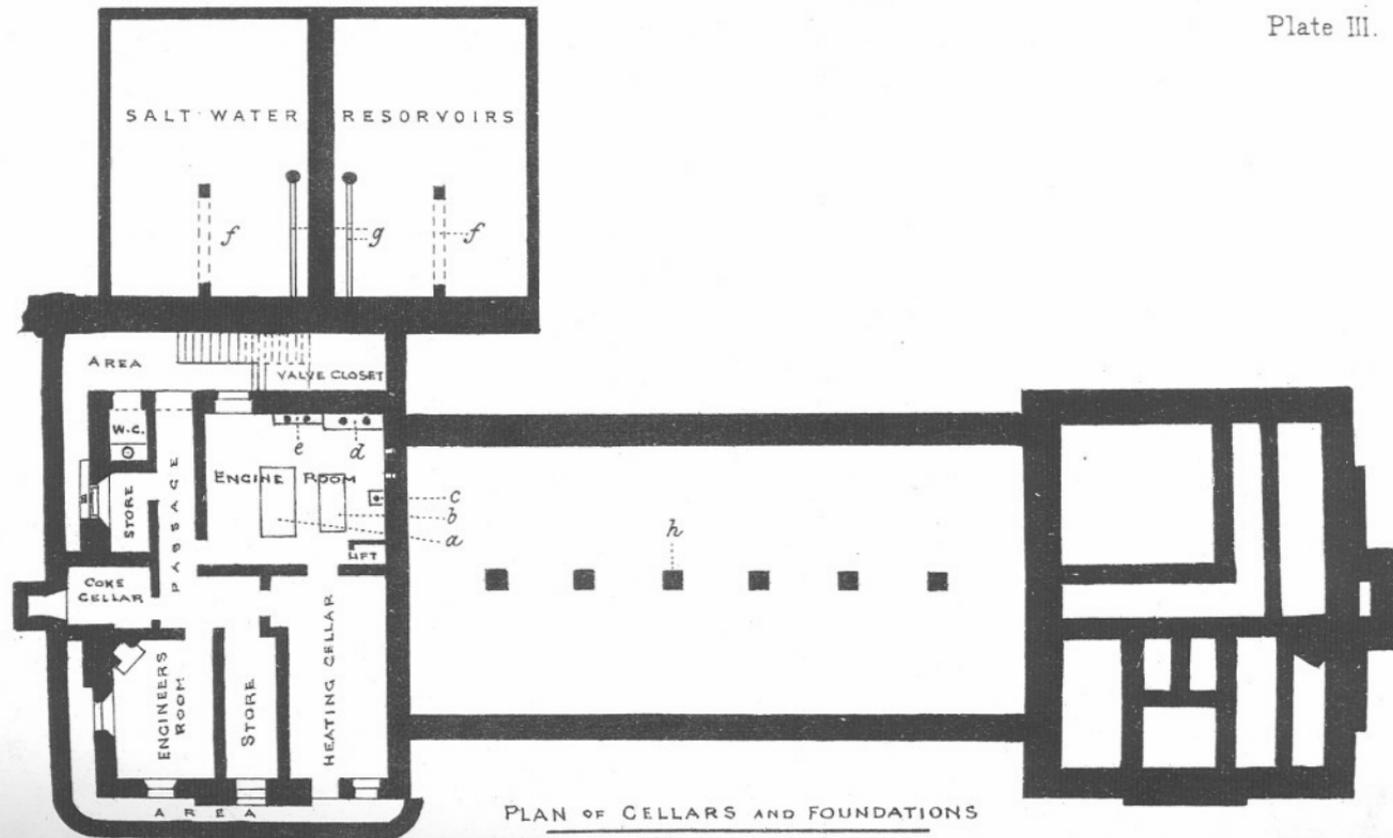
PLATE III.—PLAN OF CELLARS AND FOUNDATIONS.
